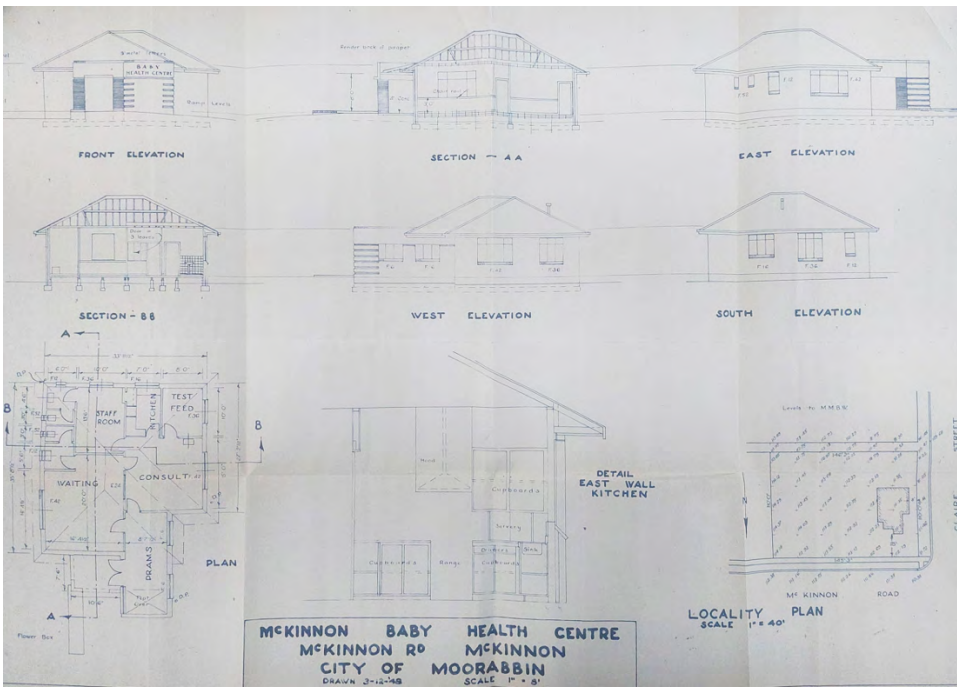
Drawings for Baby Health Centre, McKinnon, 1948. Note: it appears the centre was constructed with a window to the front projecting elevation instead of two windows to the side (Source: PROV VPRS 7882/P0001, 9489).
